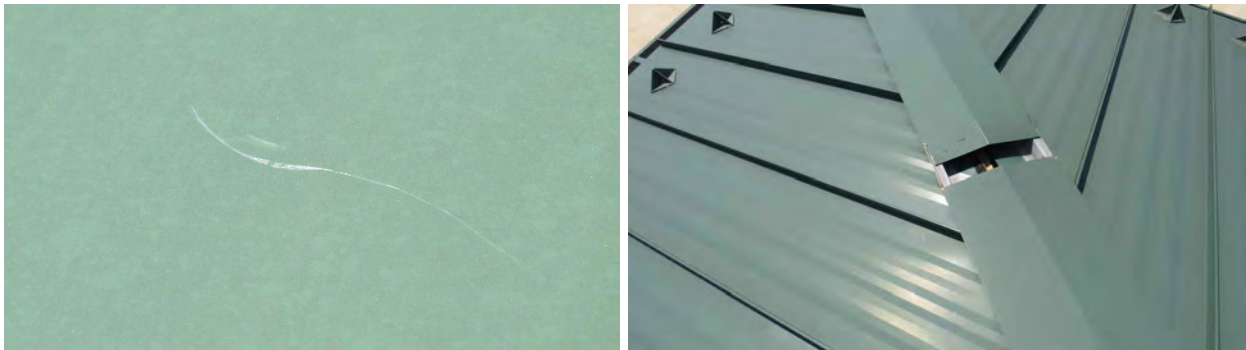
Roofing on the physical plant building (10) with no wind damage.
